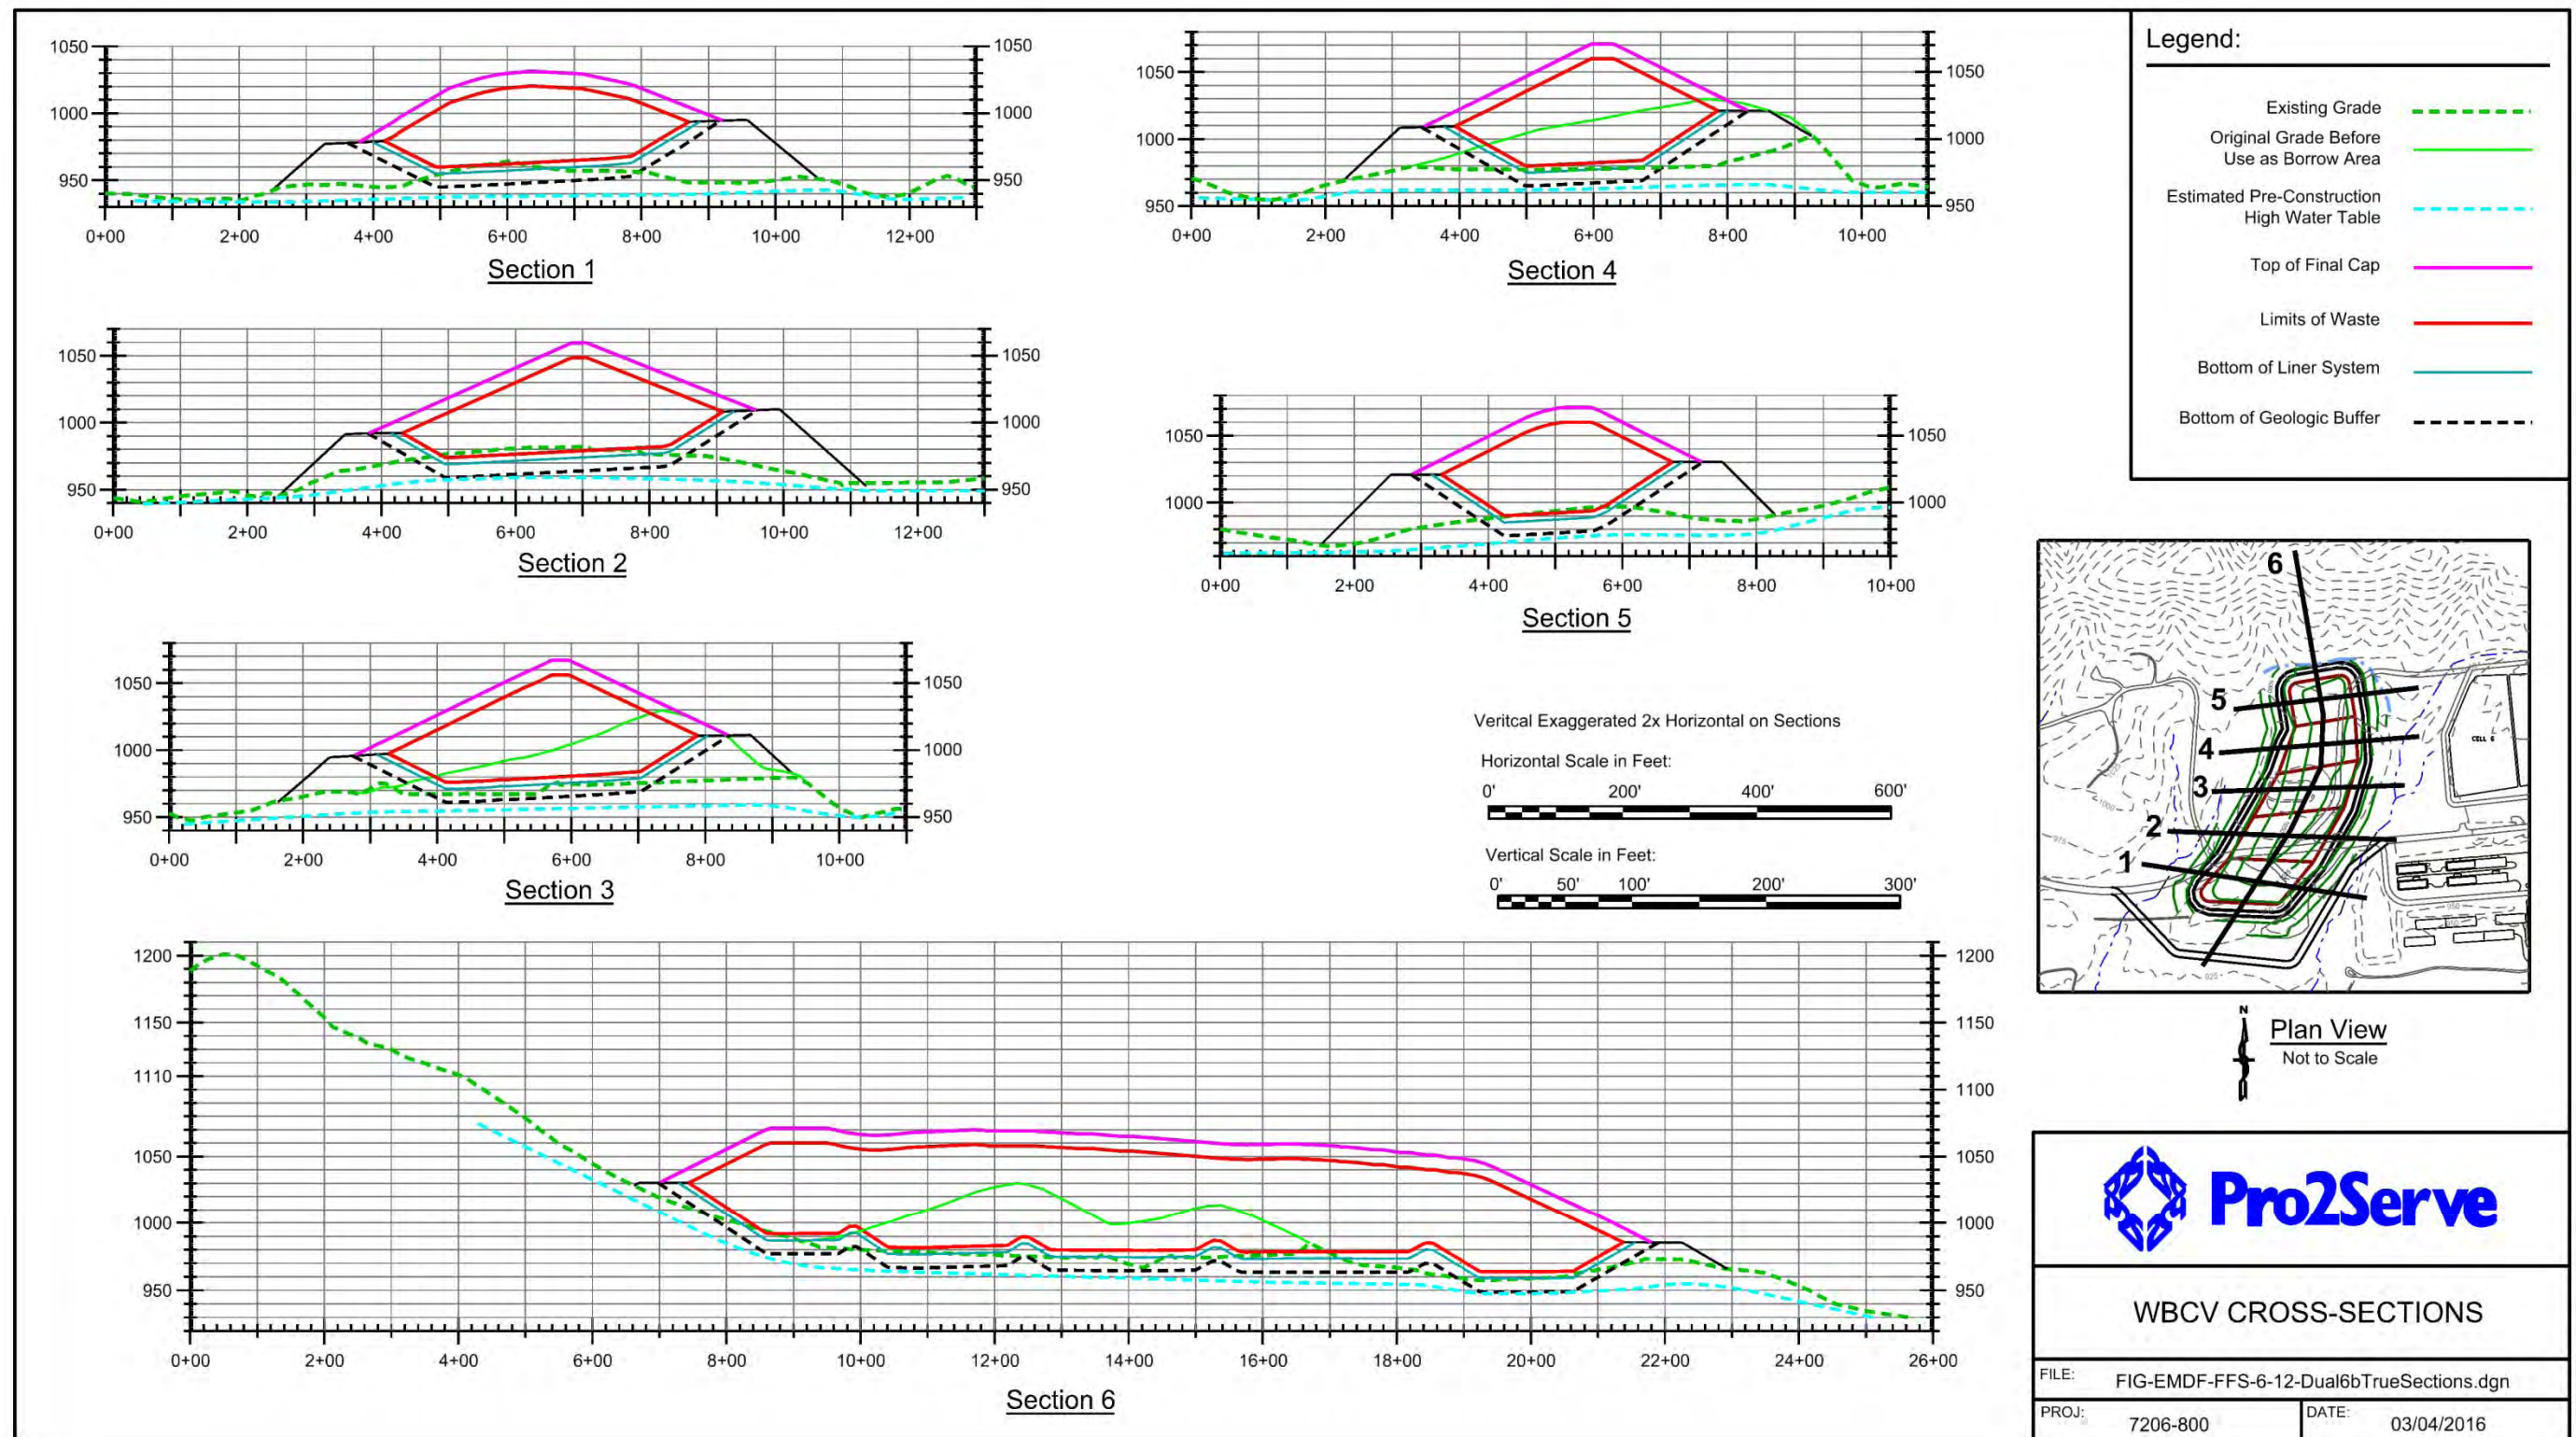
EMDF Cross-sections for Dual Site (6b)
